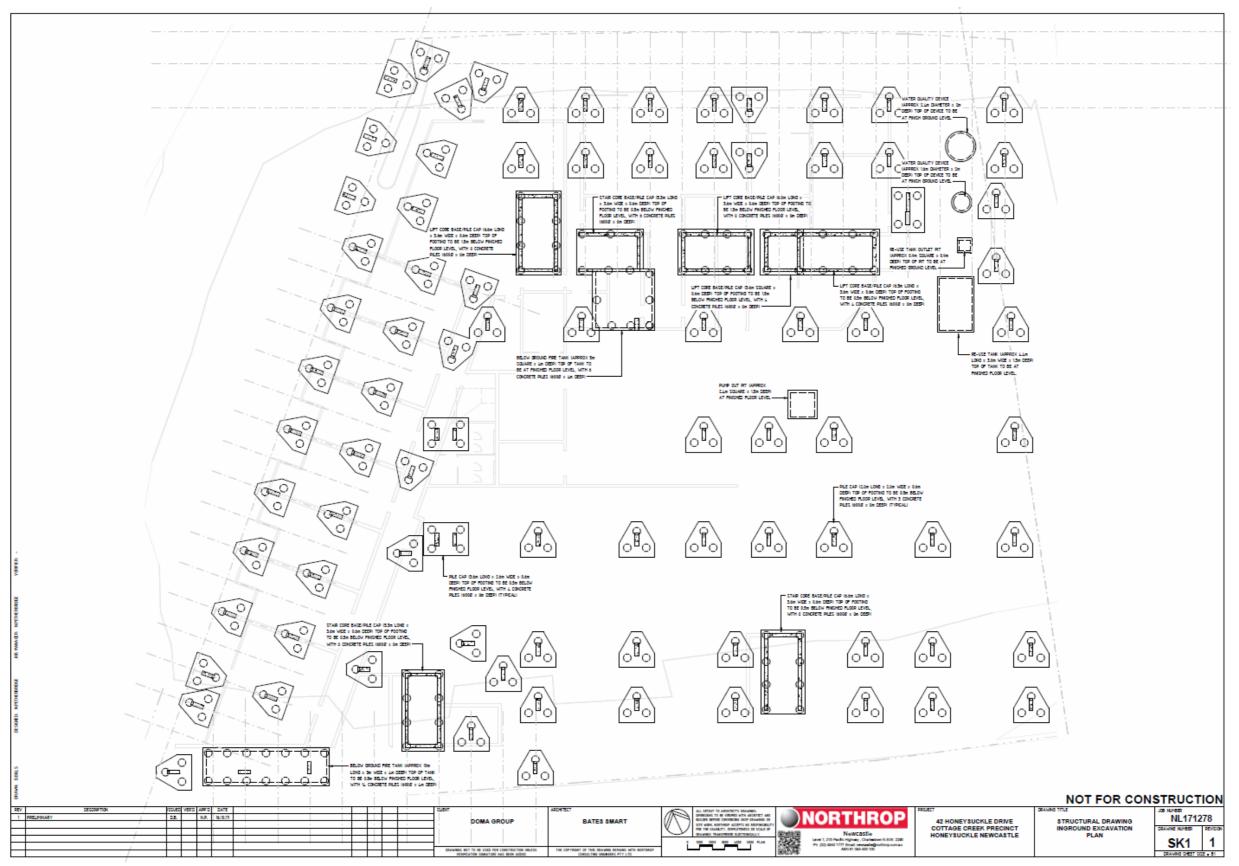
Structural drawing of below ground excavation plan for the development.
